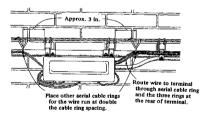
Running Wires to Terminal Installed on Strand Supporting Block Cable Attached to a Building
